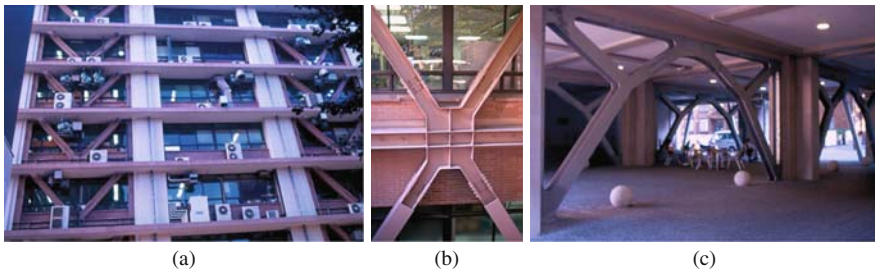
Examples of retrofitting with steel bracings (University of Tokyo buildings)
